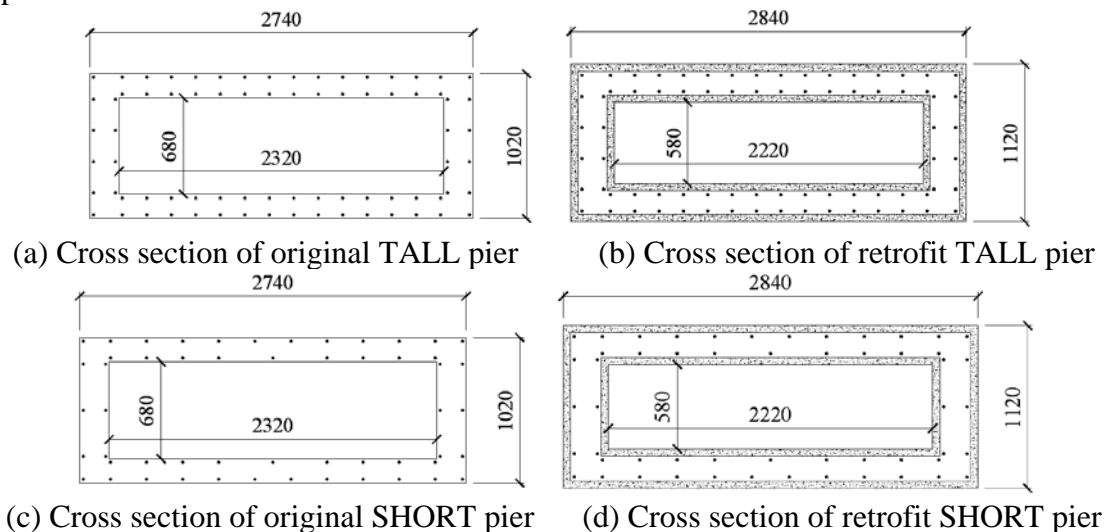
Cross section for the original and retrofit hollow bridge piers
